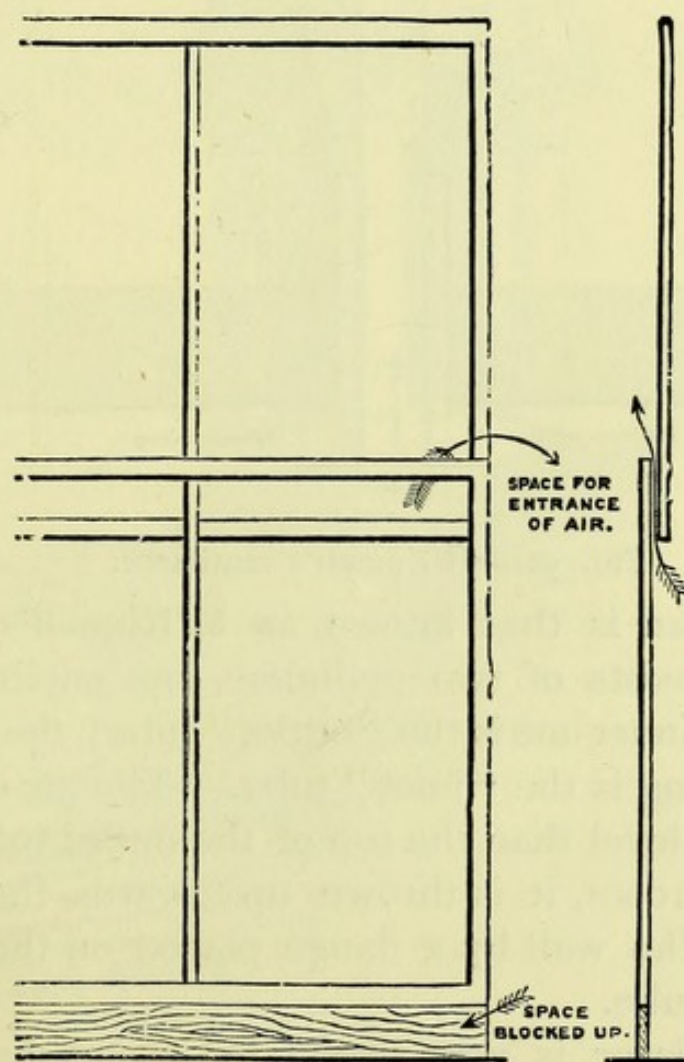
Hinckes-Bird's plan of window ventilation.
